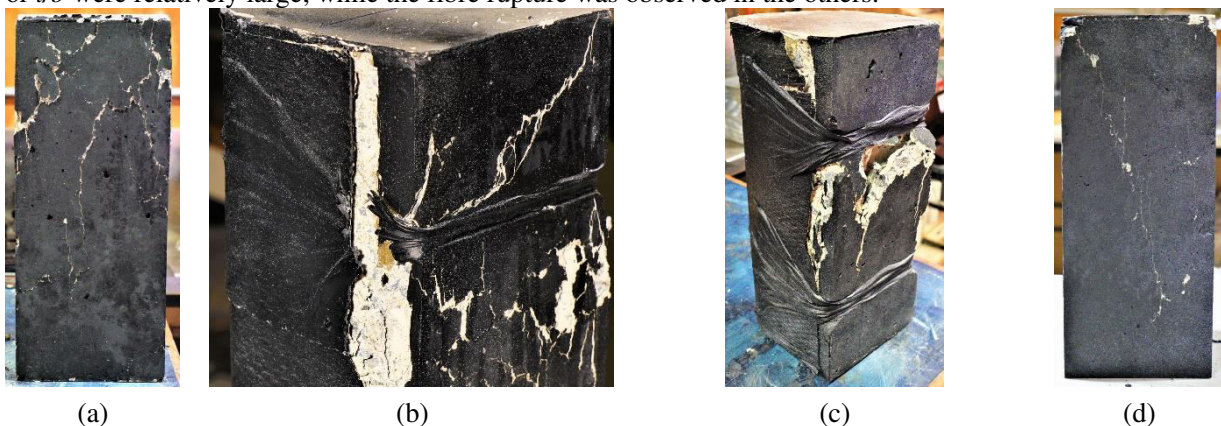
Commonly observed failure modes: (a) propagated cracks of the unconfined prism (b) fibre rupture; (c) concrete-controlled failure with spalling; (d) concrete-controlled failure without concrete
